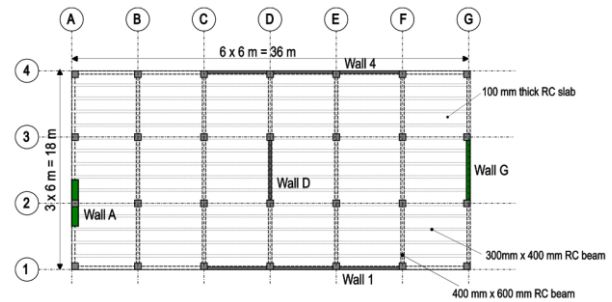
Floor plans of the building (Walls at grids A and G are new walls) (Adapted from FEMA P-2006).
